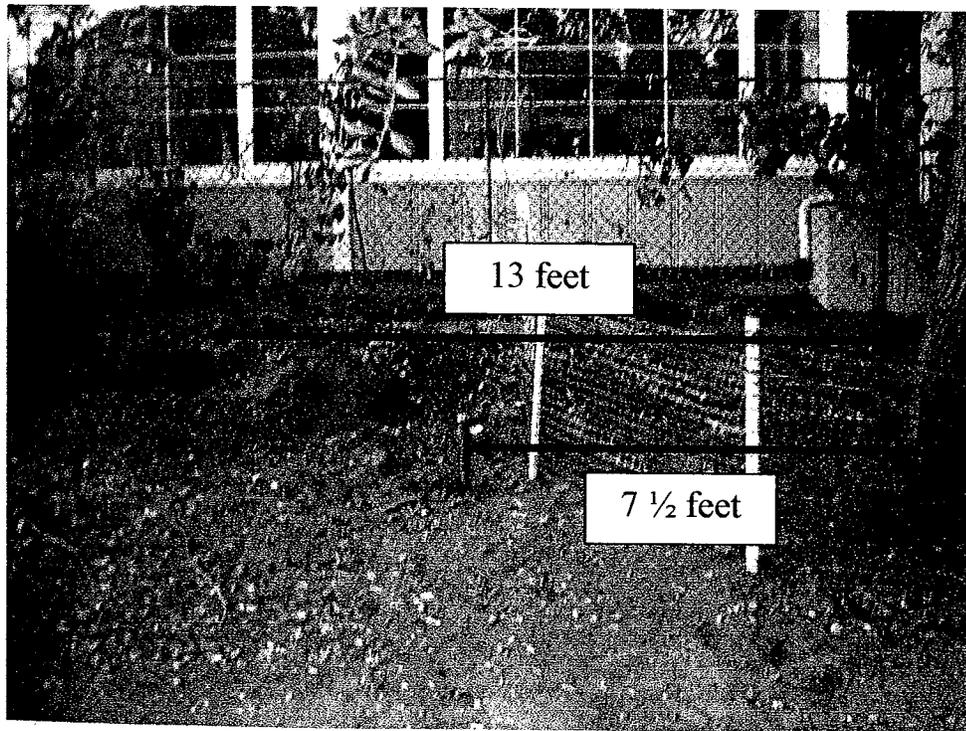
An irrigation valve manifold is 13 feet and an electrical conduit is seven and a half feet from the trunk of Tree #2. The trenches were dug radially from the trunk.
